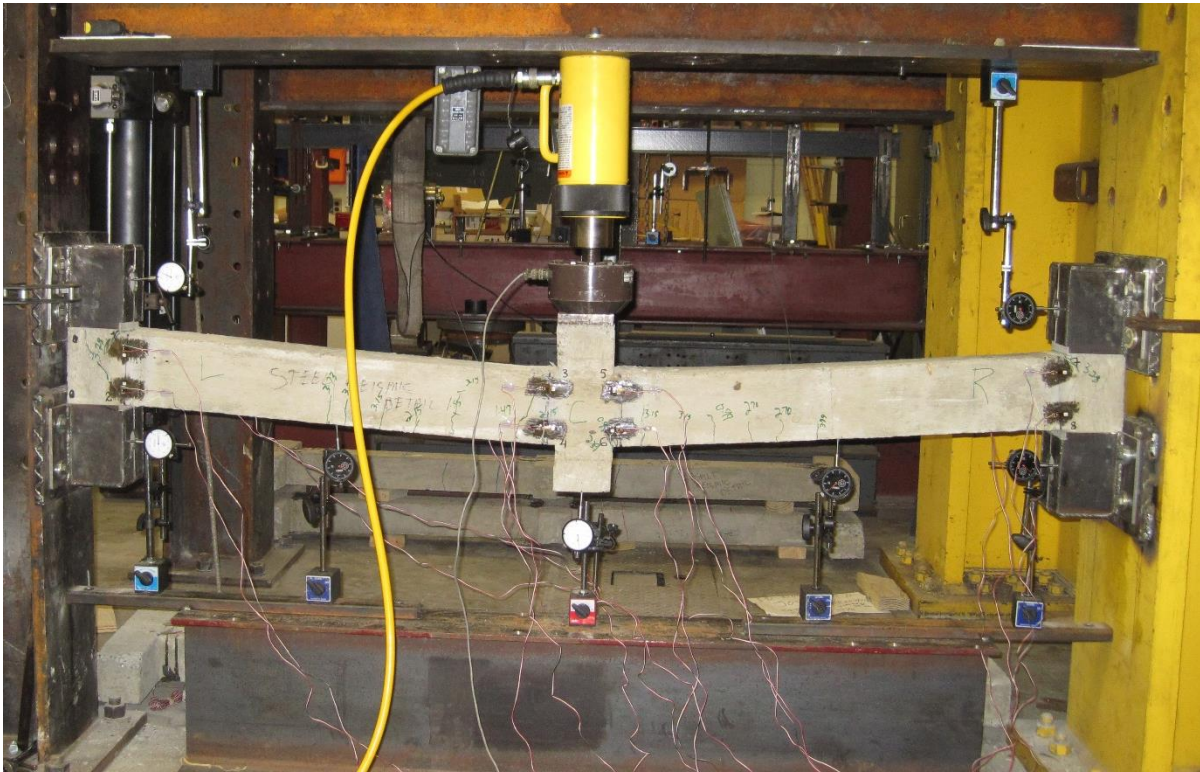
Crack Pattern at the Collapsed Load for Sub-assembly S2-2
